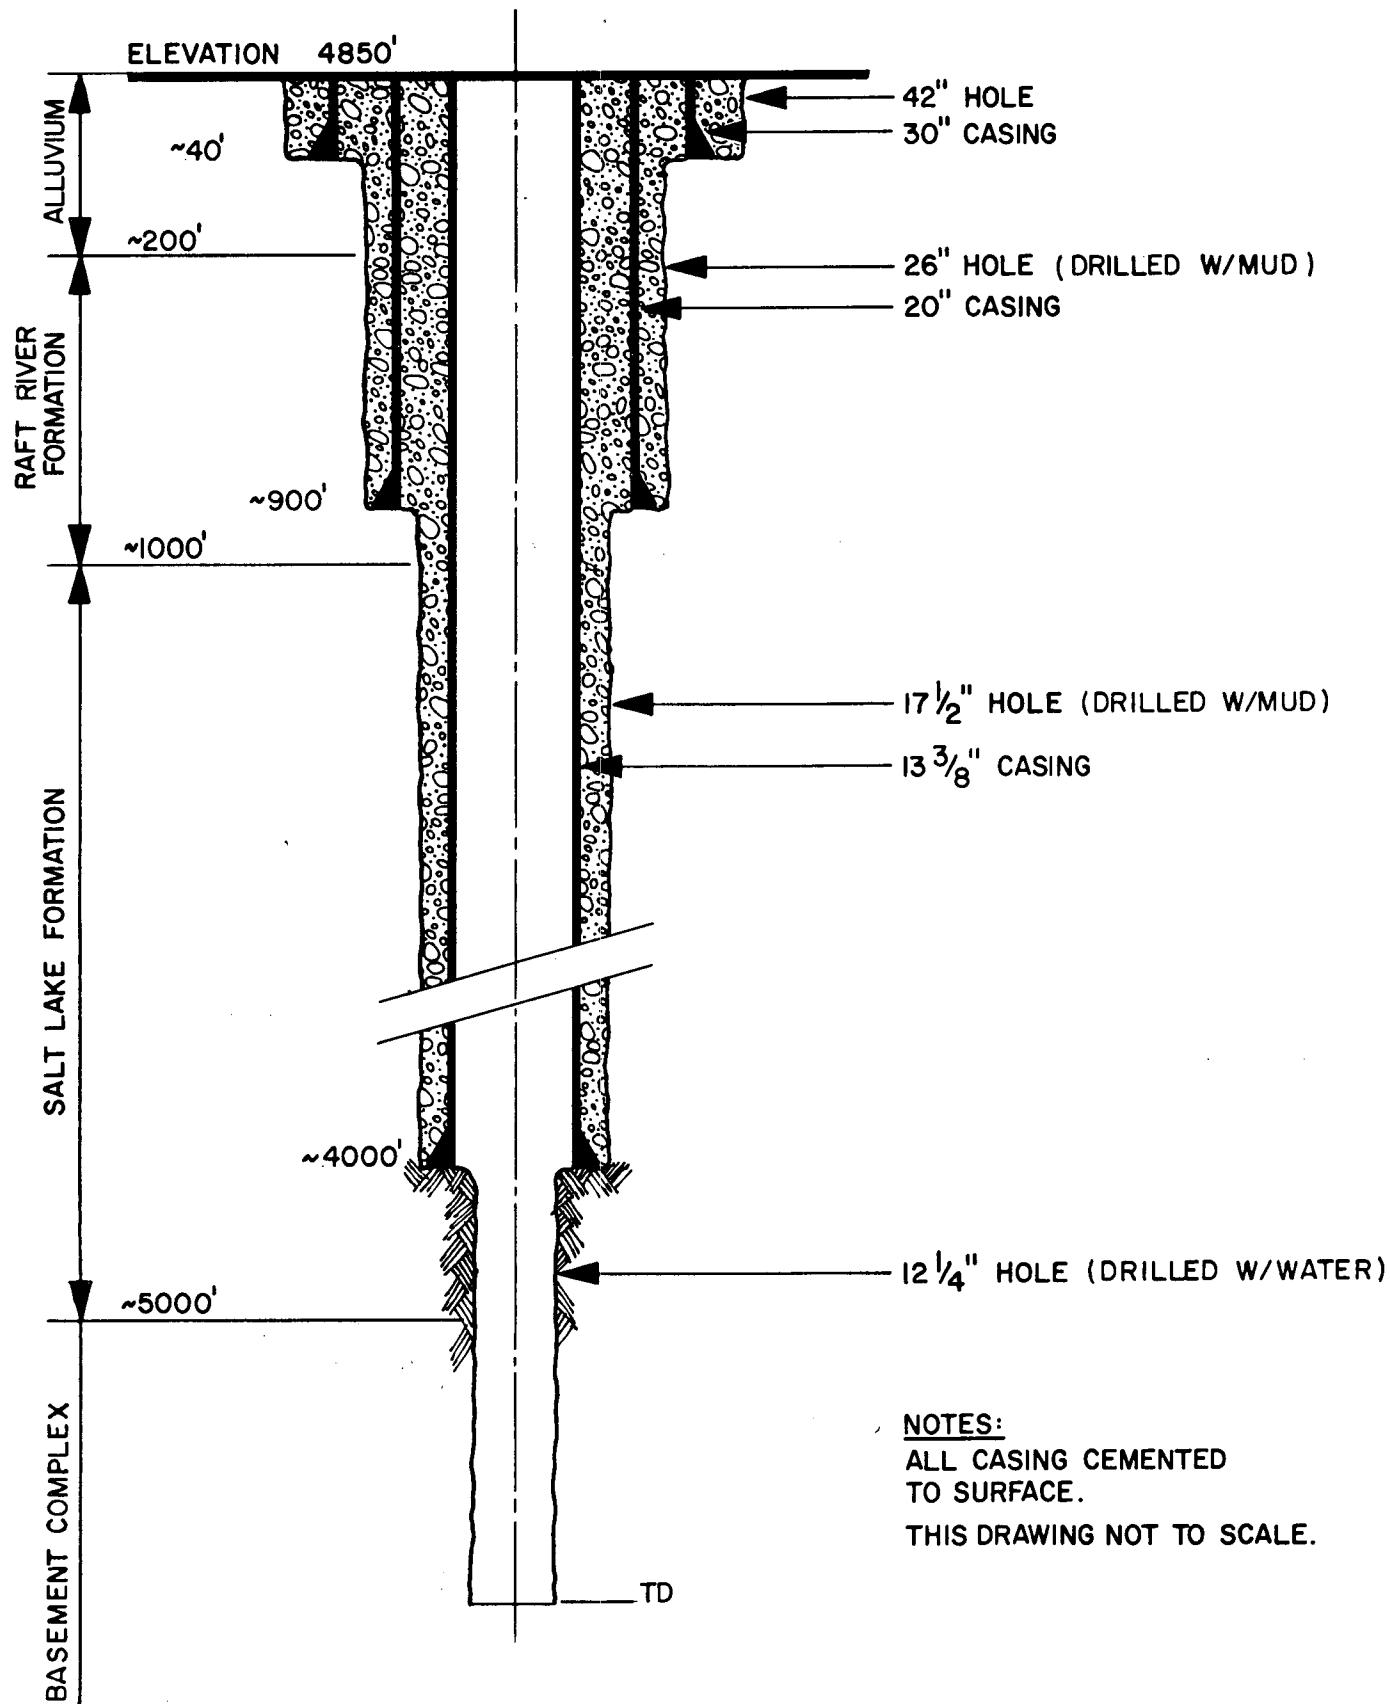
RAFT RIVER GEOTHERMAL EXPLORATORY HOLE NO. 2
